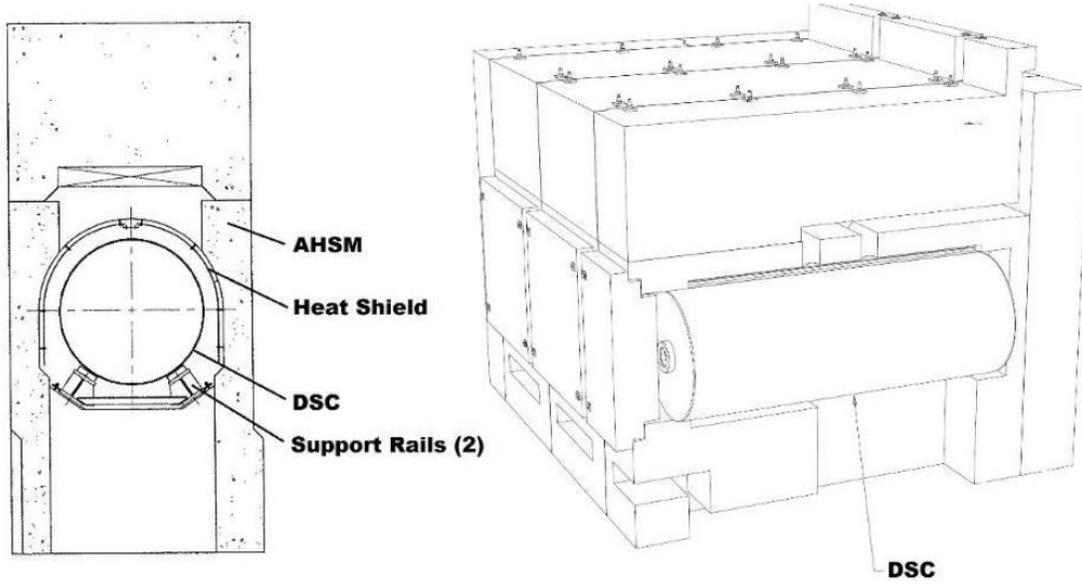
NUHOMS Waste Storage Facility Photos and Cross-Section
